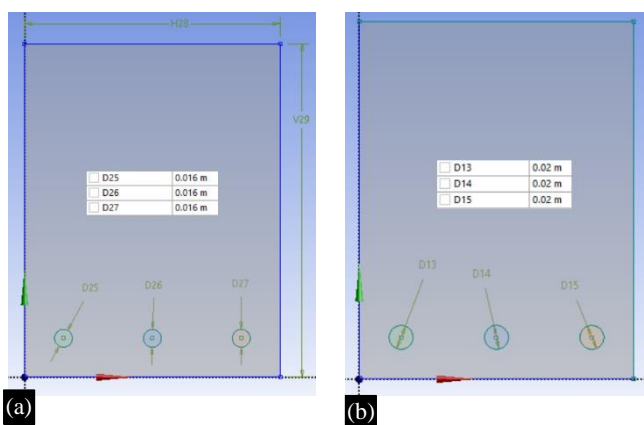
Concrete section with (a) GFRP rebar (b) Metal rebar.
